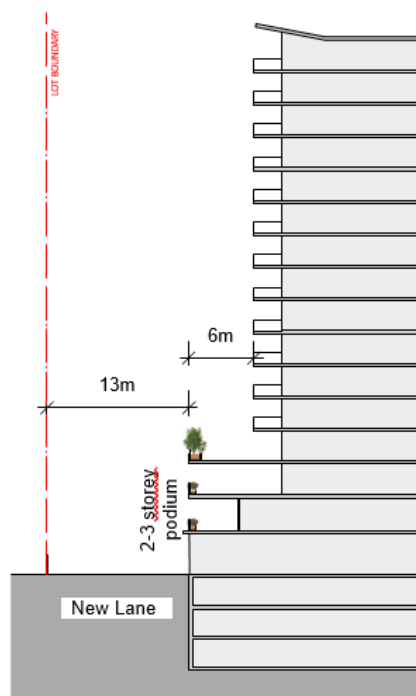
Setbacks to New Lane connecting Carlingford Road and Rawson Street
